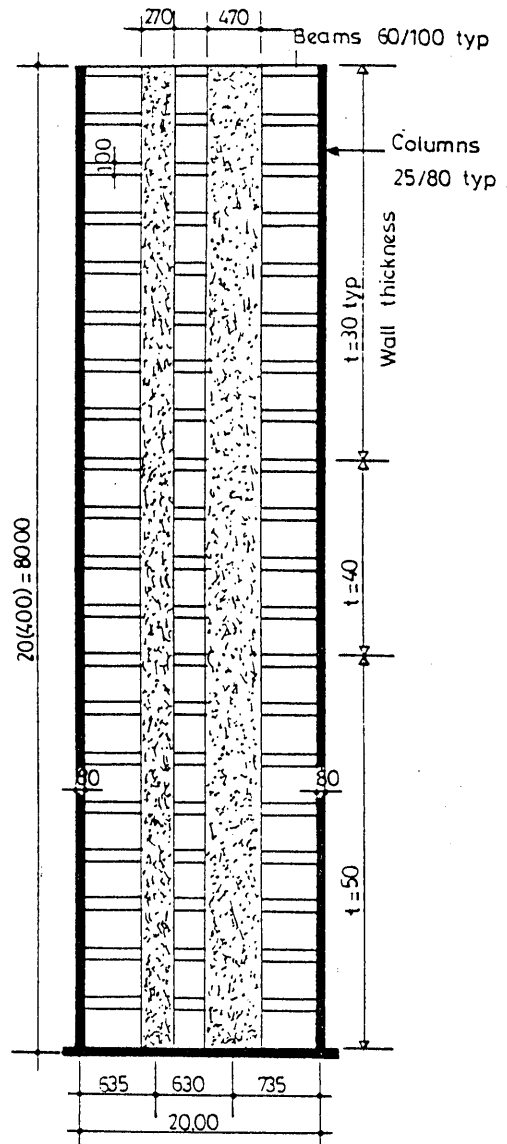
FLOOR PLAN - FRAME BUILDING (20-Storey)
